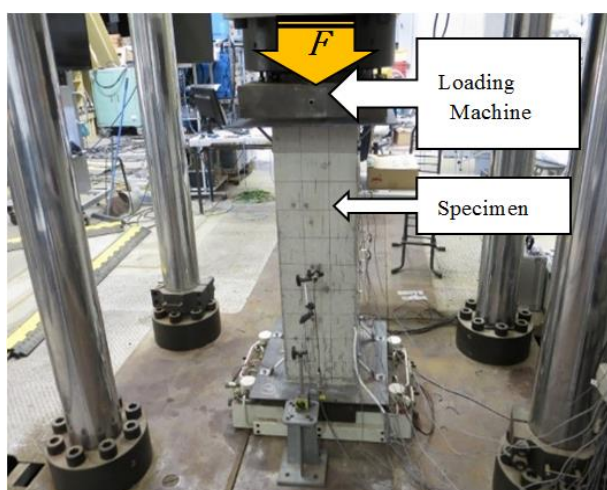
Structural drawing of the compressive loading machine and the specimen ($300 \times 400 \times 1000$ mm) used for the 500 t compression test.
